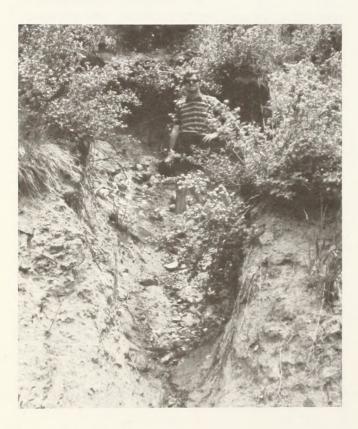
Large gully in slope, Watershed No. 1, Pine Creek study area, Boise National Forest, Idaho. Gully was formed by subsurface flow emerging at cut face followed by piping and "spring sapping," which triggered localized slope failure. (Photo taken July 1977.)
